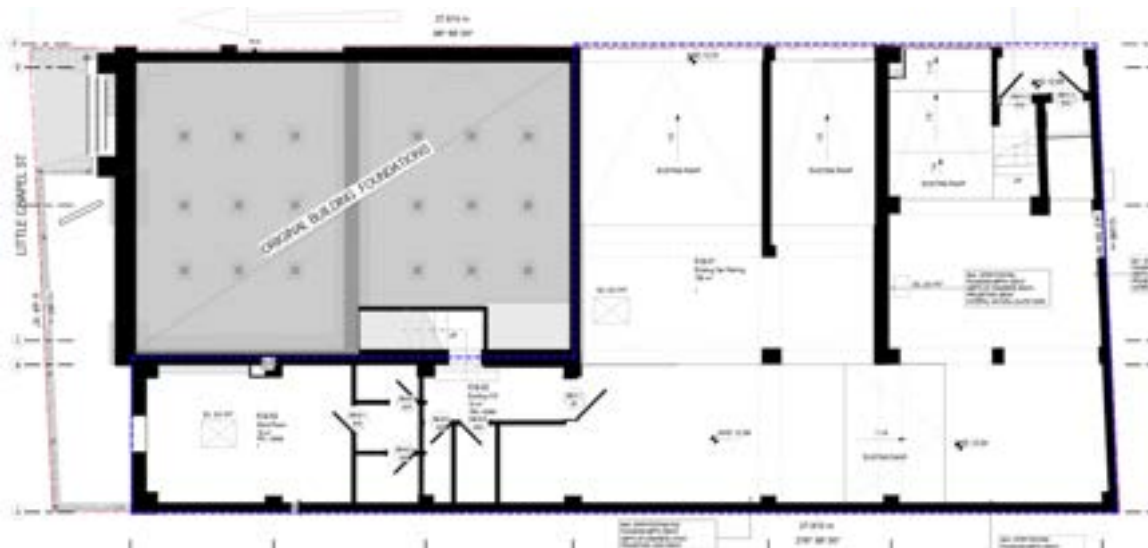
A1-100 Existing basement floor plan. Source: Trethowan Architecture, 2025.
